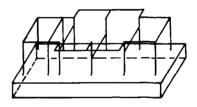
3 D SCHEMATIC VIEW OF TG. FOUNDATION.
